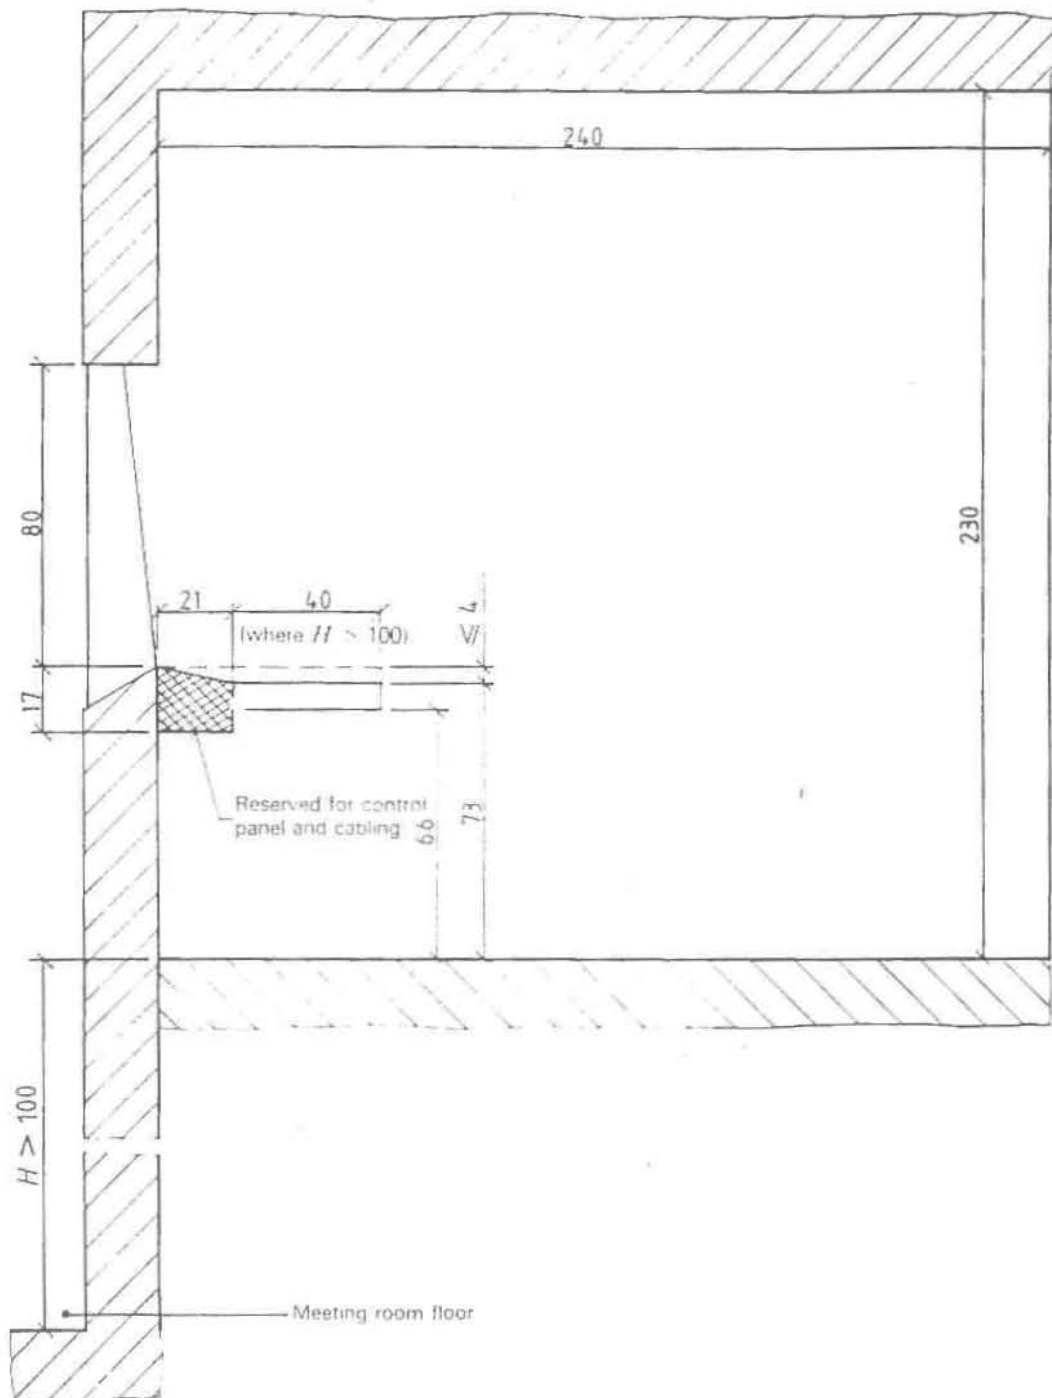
Schematic layout for a booth at elevation higher than 100 cm (illustrating a flush-mounted control panel arrangement)
